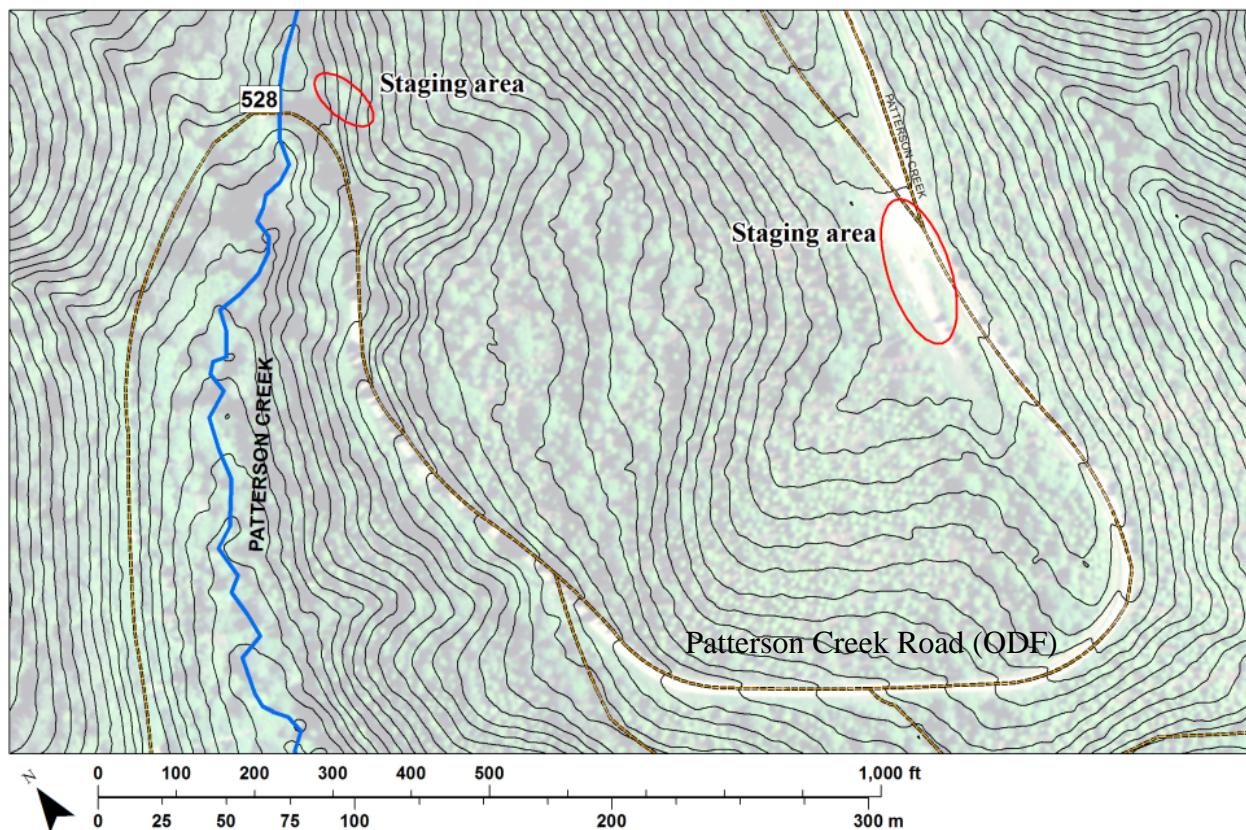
Patterson Creek Road at Crossing 528. Potential staging areas for fill to be used during construction. Eastern site is larger, located 0.4 miles away from Crossing 528.
